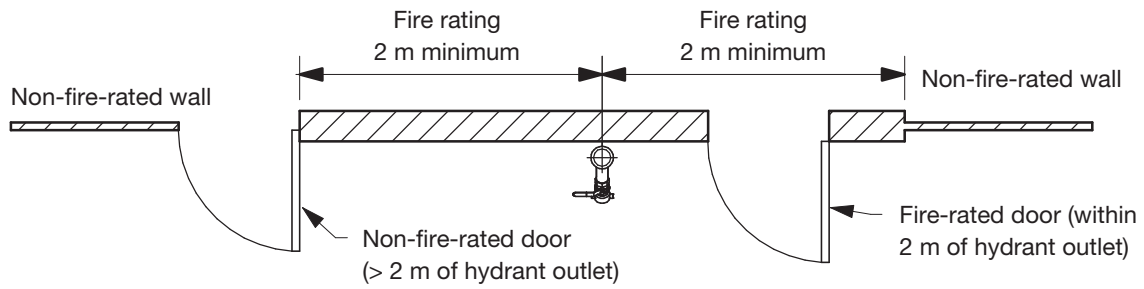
Unsprinklered building – Hydrant outlet protection – Fire rating options with doors – Plan view
